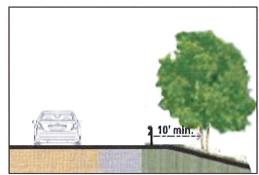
10' min. setback for trees and shrubs planted behind guardrail.
